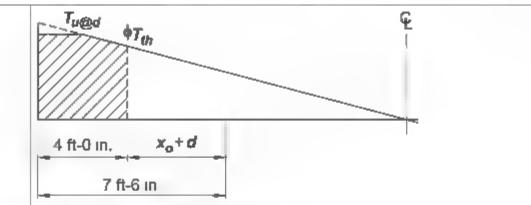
Typical torsion reinforcement in a span applied at both ends of a span
